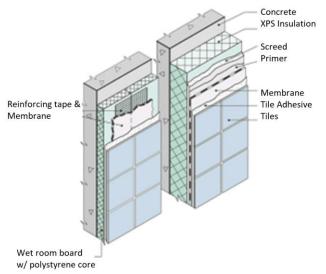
Stable Base for Tiles w/ One Building Panel on Wooden Frame w/ cc = 300–400 mm. Ref Fig 54c [54]
